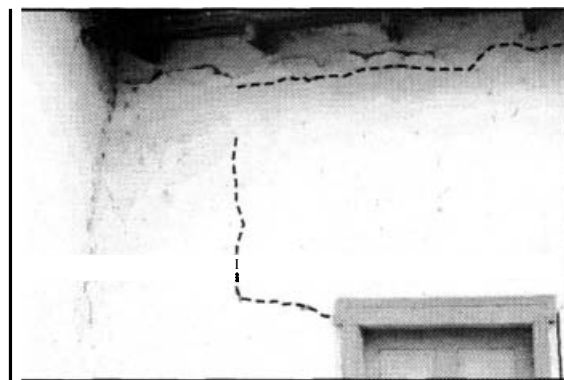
Additional minor damage at a window opening and the roof line in a wall near the southwest side of the building (dotted line along crack).
